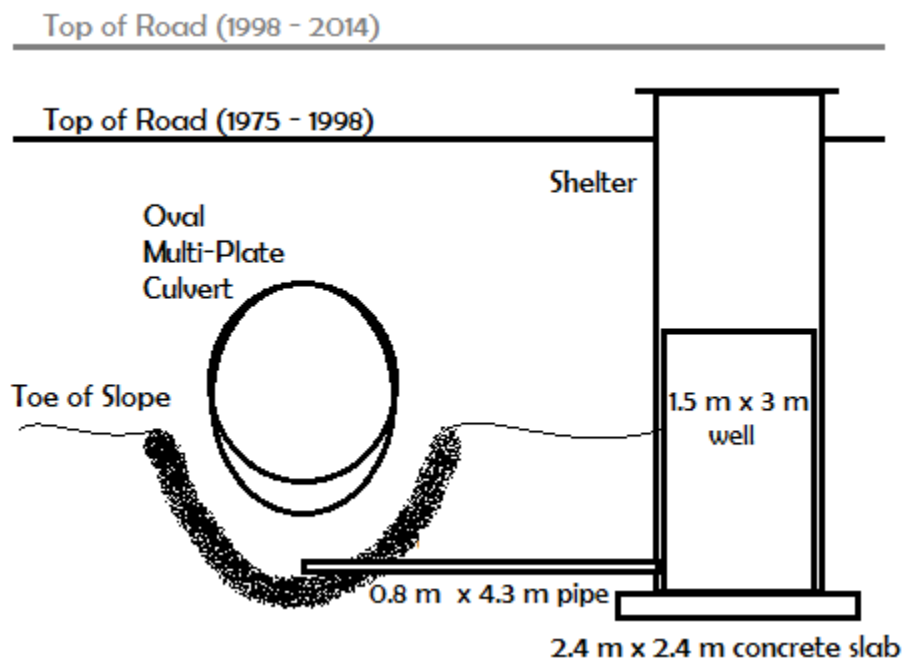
Sketch of the Smith Creek gauging station looking downstream (adapted from public records at the Water Survey of Canada)
